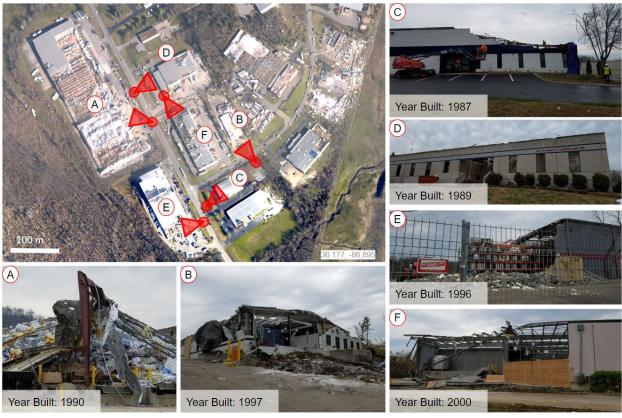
Cluster of damaged, large-volume industrial buildings west of the John C. Tune Airport sampled by FAST. Damage ranged from structural collapse of multiple bays (e.g., Building A) to moderate loss of metal roofing panels and insulation. Structural systems were steel-frame buildings with primarily CMU in-fill walls, steel roof joists or purlins, and corrugated metal deck.
